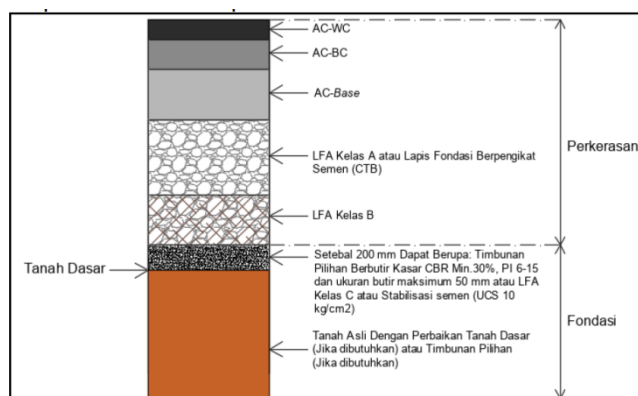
Flexible Pavement Layer Structure (Pavement Design Manual 2024)
